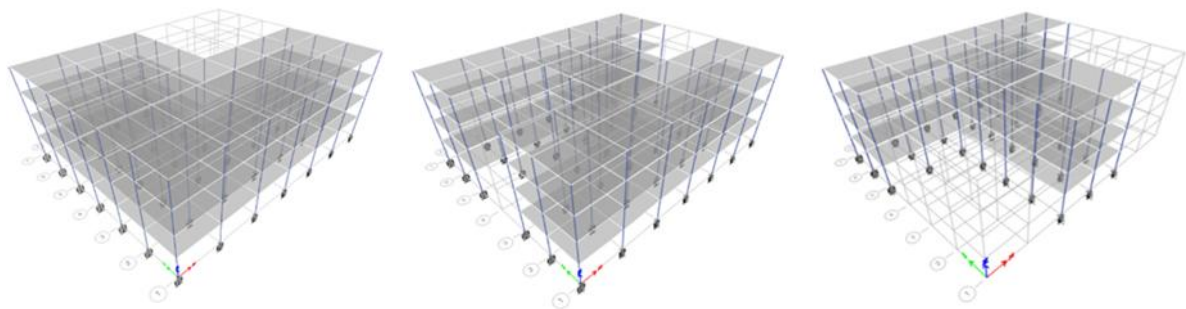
Isometric Views of L, I & T-Shaped Building Models
